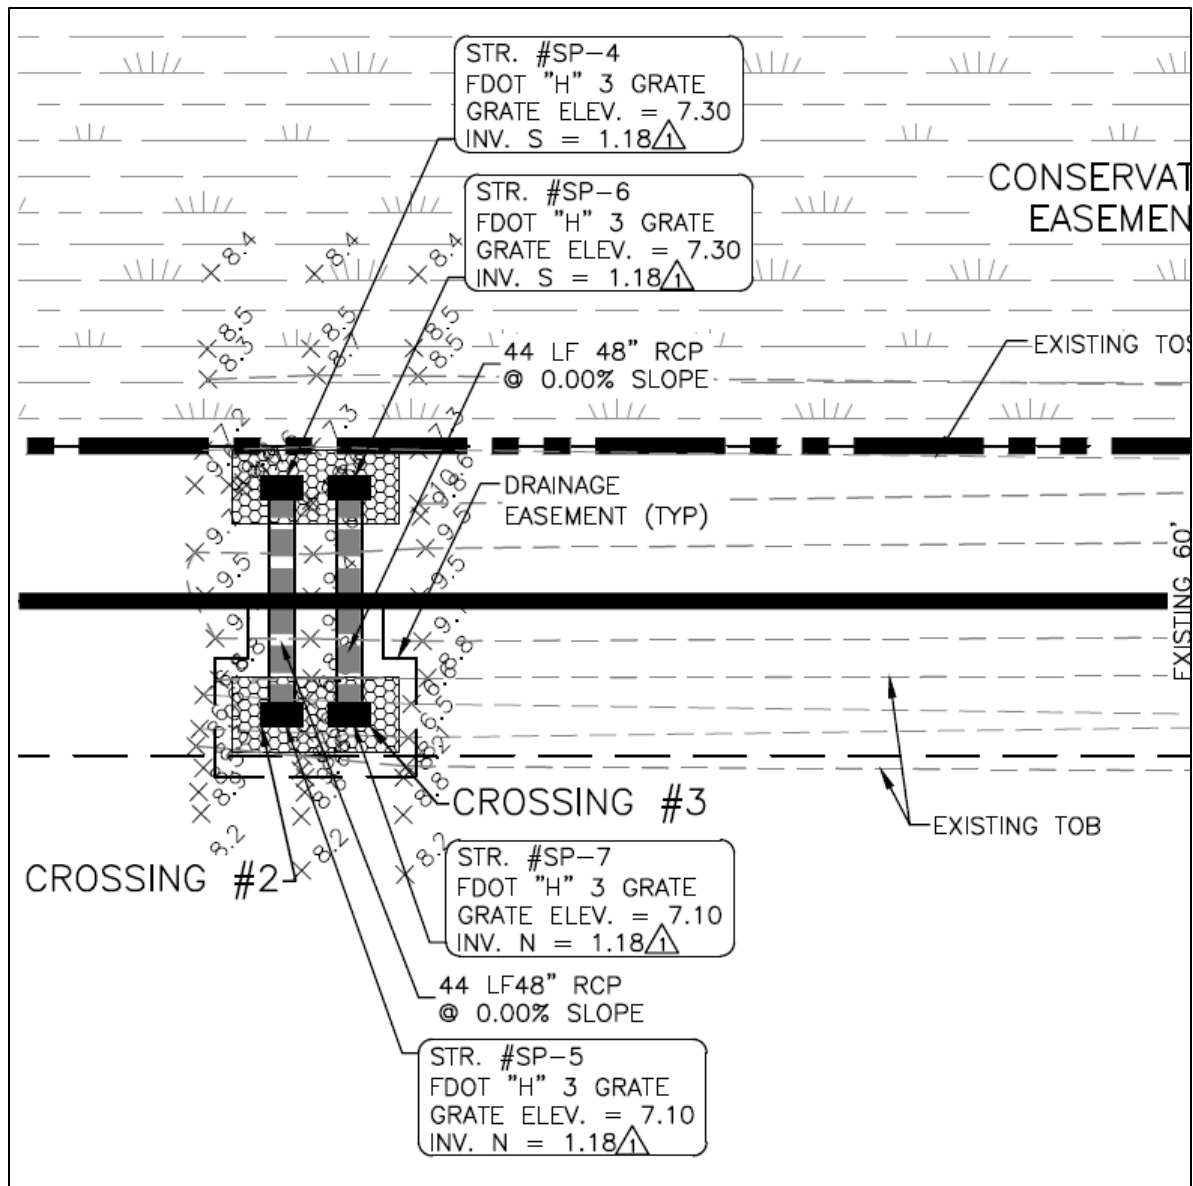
Representative Sabal Palms Road Crossing (#2) Image Modified From Hacienda Lakes Permit Plans.
